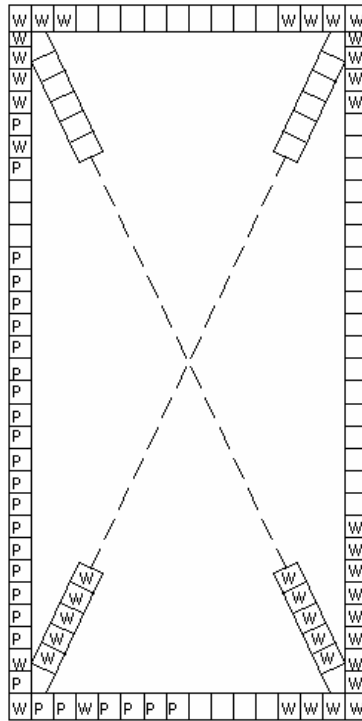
Sheathing nail failure modes for Wall A5.
